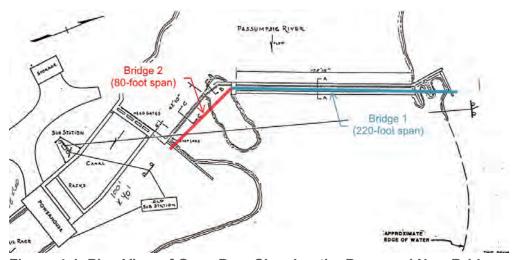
Plan View of Gage Dam Showing the Proposed New Bridges
